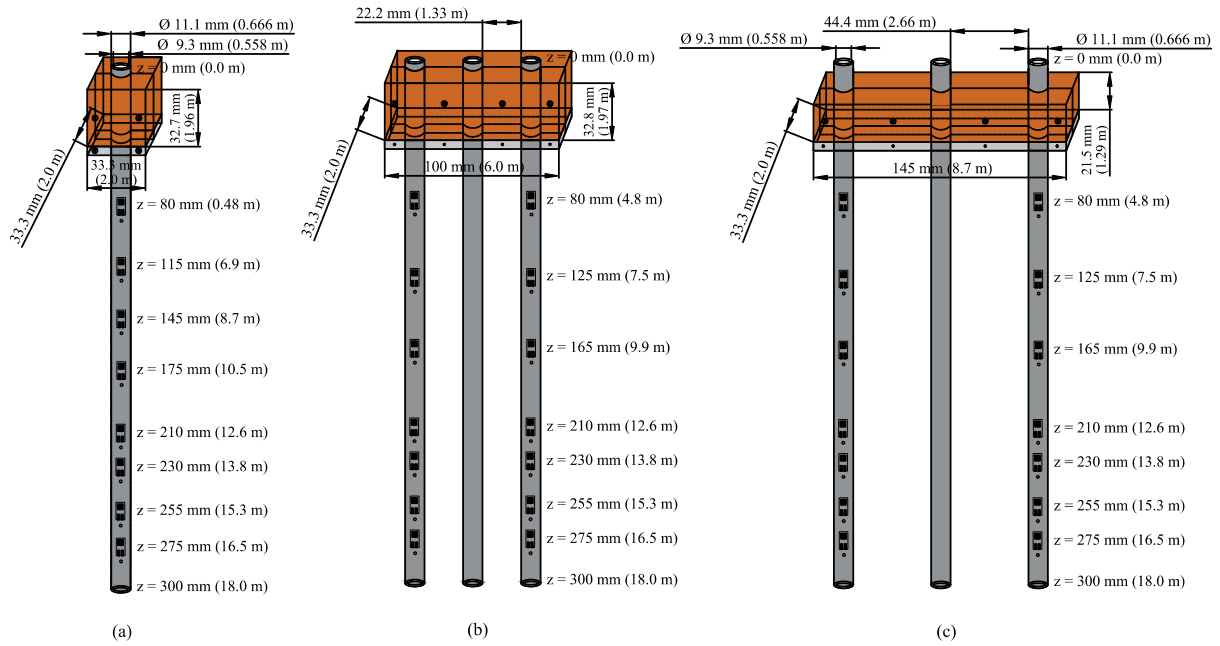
Schematic view of the pile foundations tested (a) single pile (SP) (b) closely spaced pile group (CPG) and (c) widely spaced pile group (WPG).
